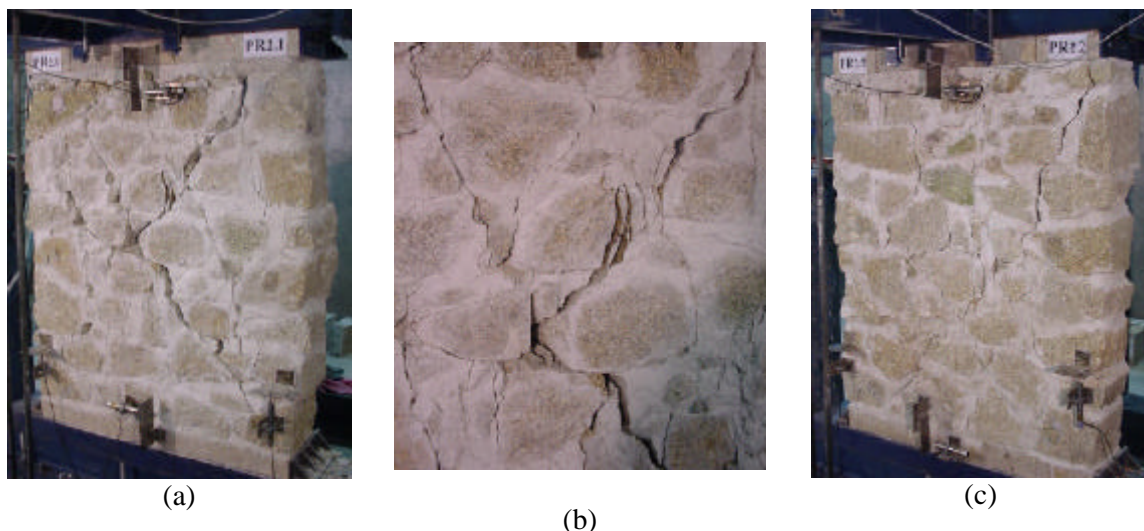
Failure mode and collapse of the walls WR.175; (a) collapse of the wall WR1.175; (b) detail of the stone cracking along diagonal crack of wall WR1.175; (c) failure pattern of the wall WR2.175
